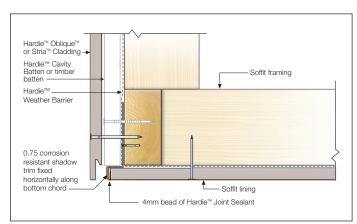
FACADE/SOFFIT JUNCTION - CAVITY FIX
